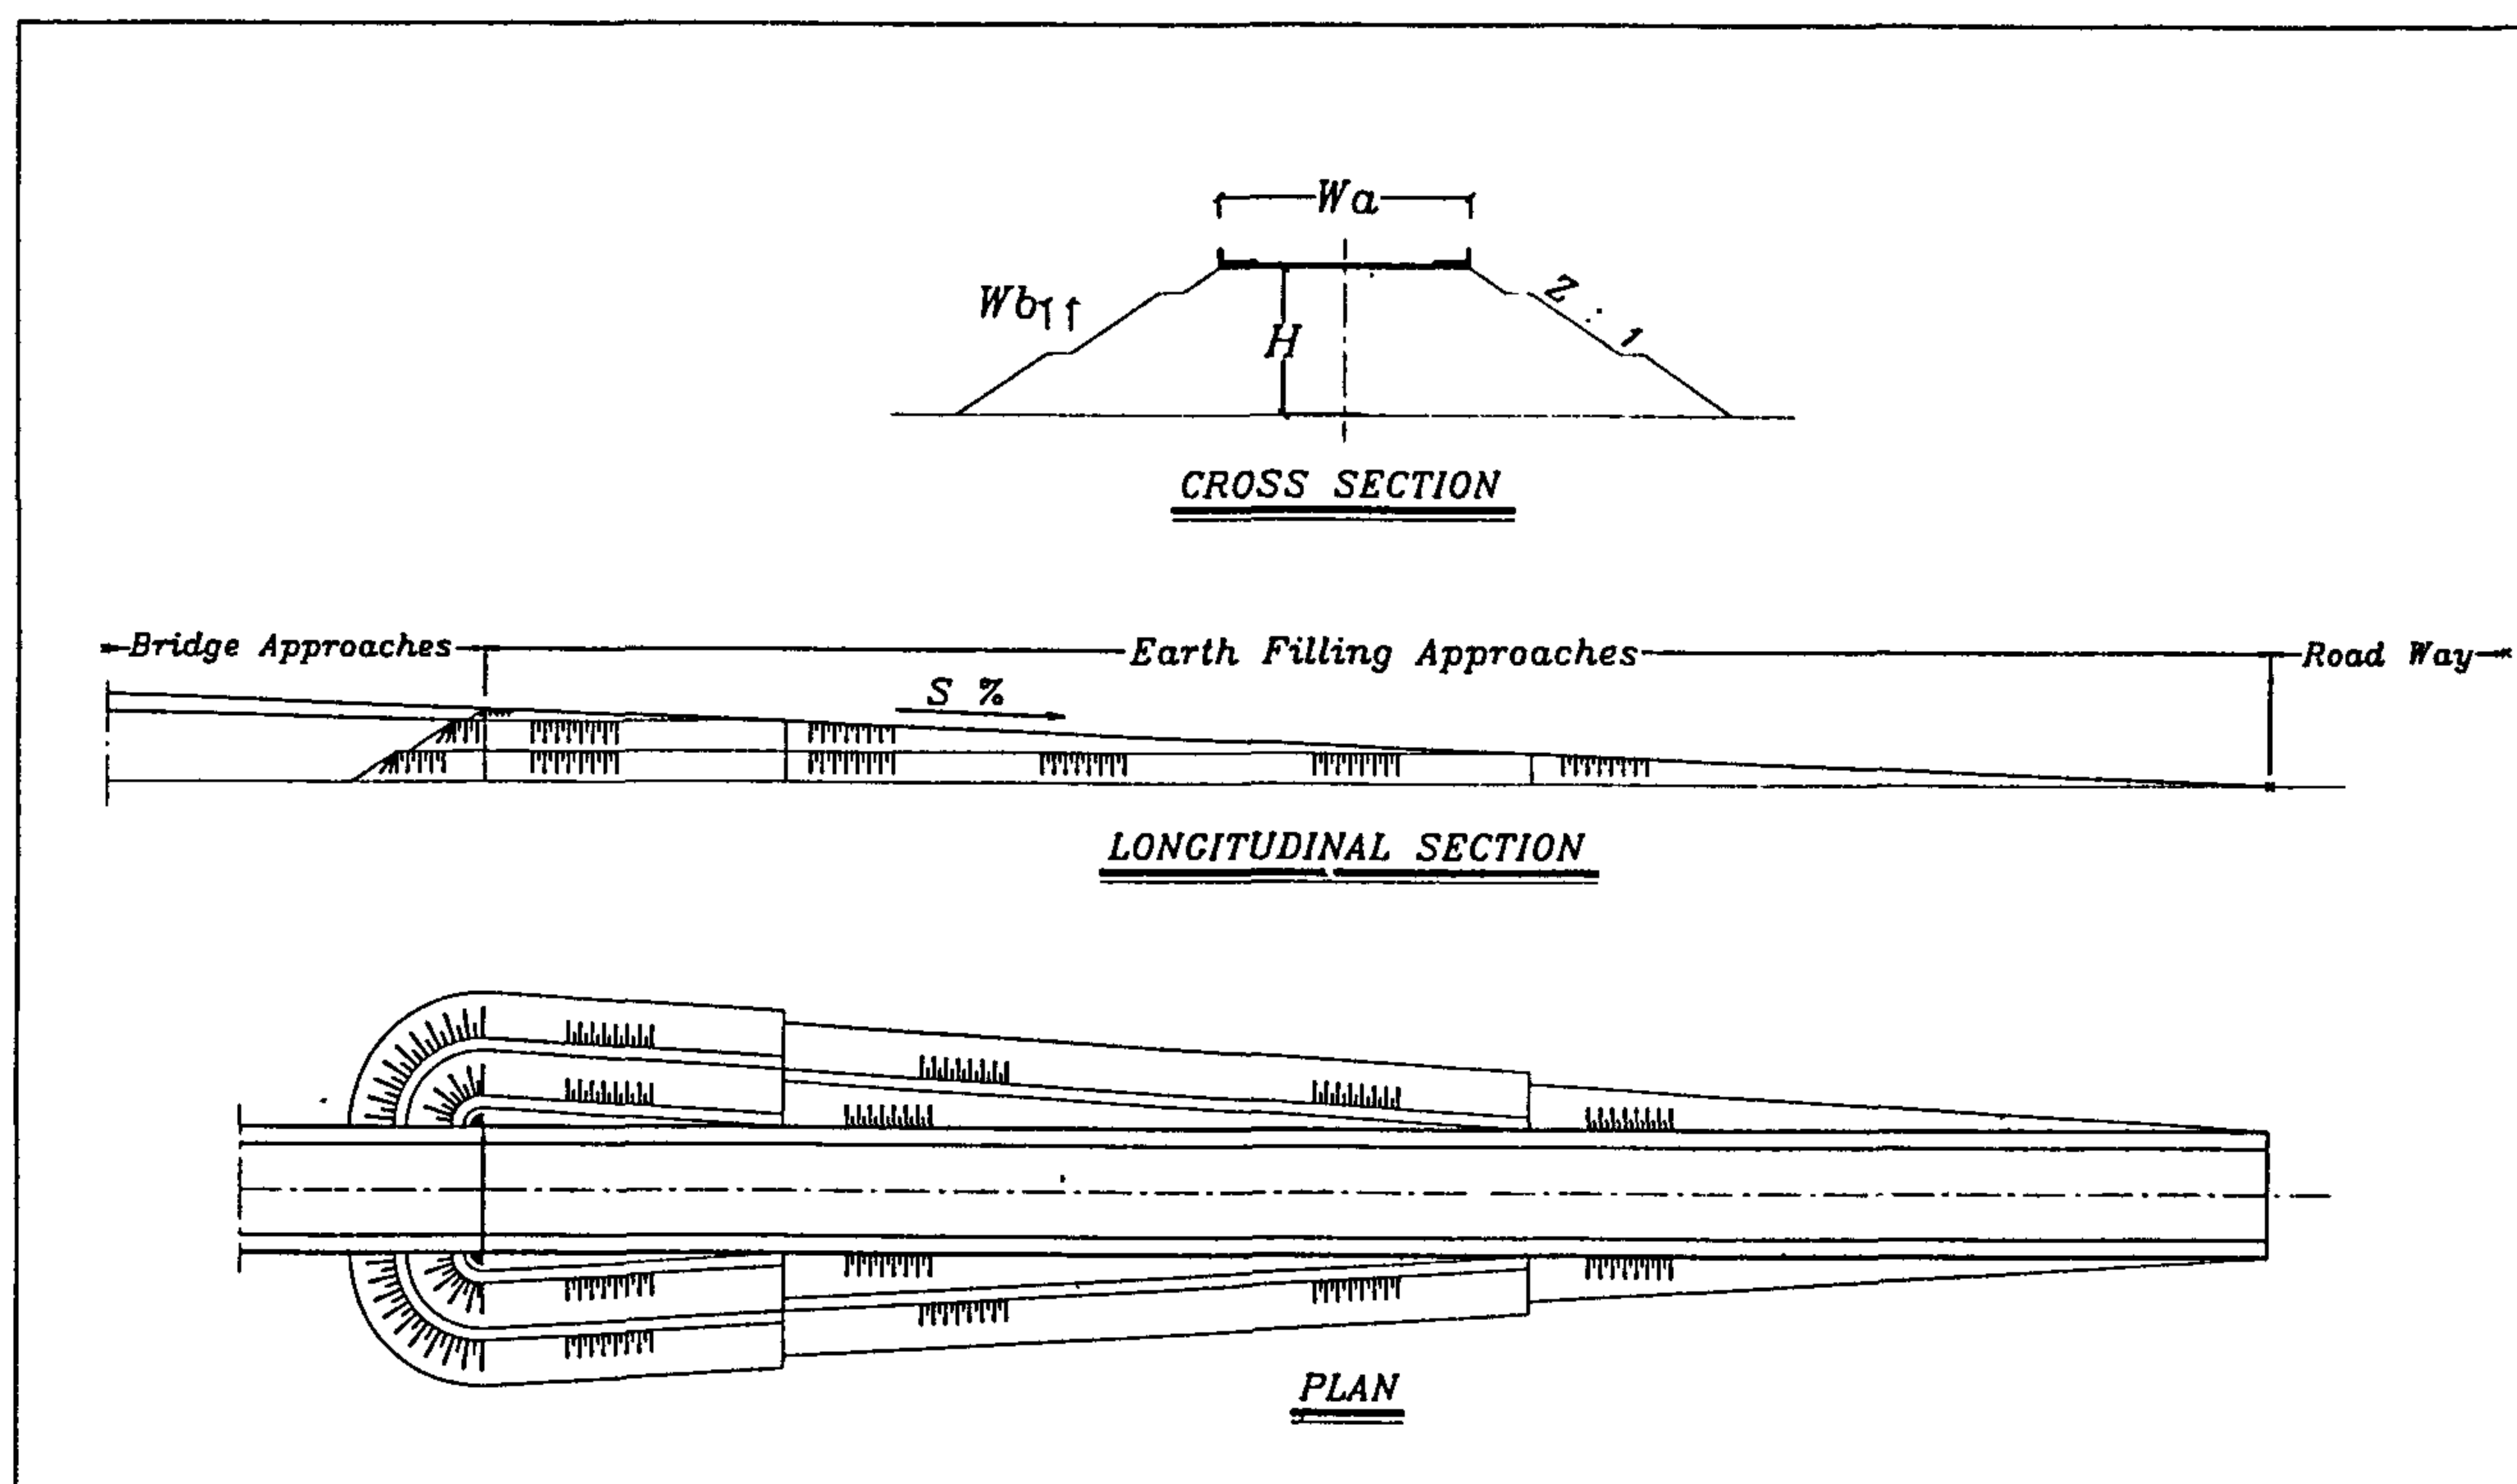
Typical plan, longitudinal section, and cross section of earth filling approaches.
